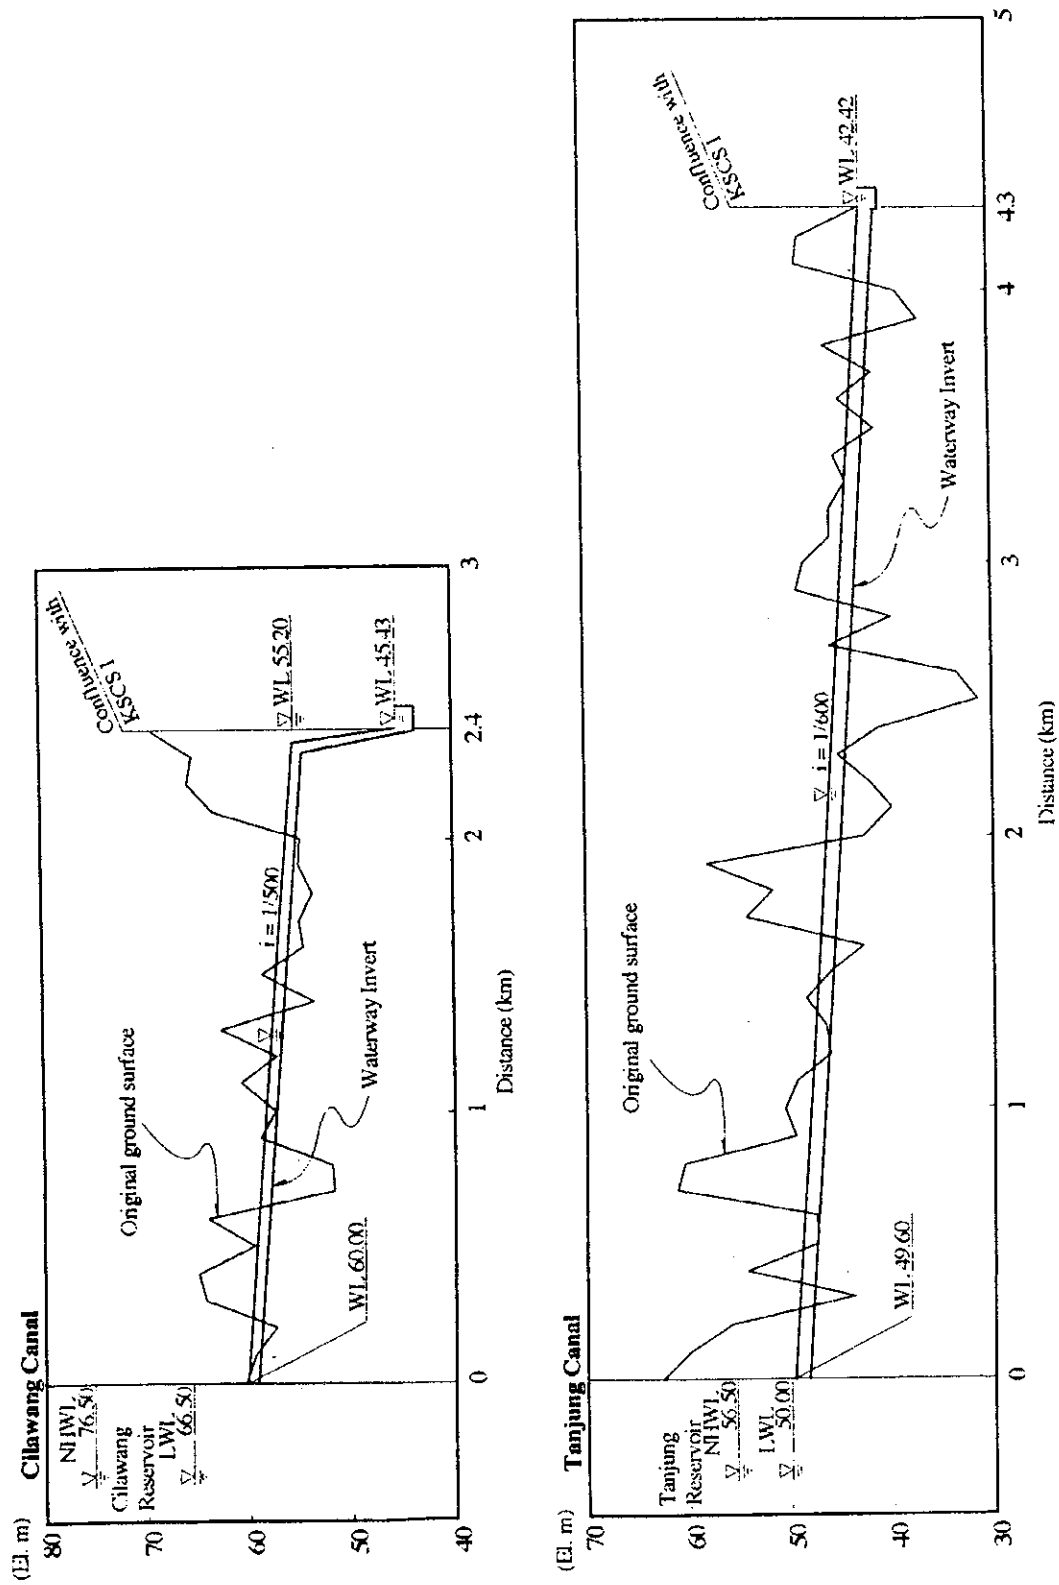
PROPOSED LONGITUDINAL PROFILE OF TANJUNG AND CILAWANG CANAL
